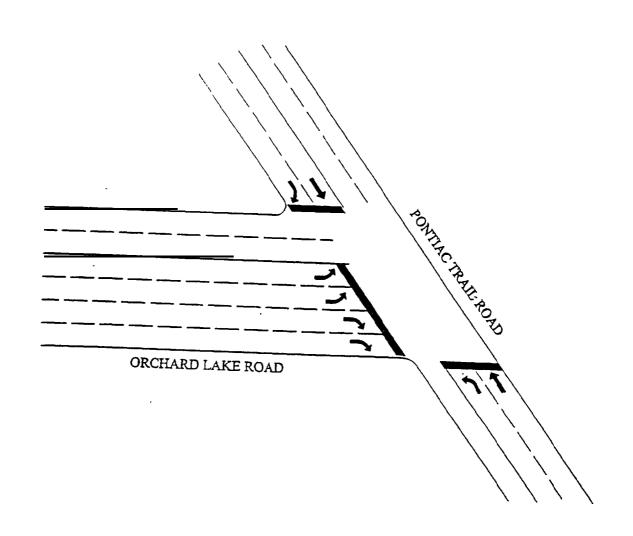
Layout of Orchard Lake Road & Pontiac Trail Road Intersection
